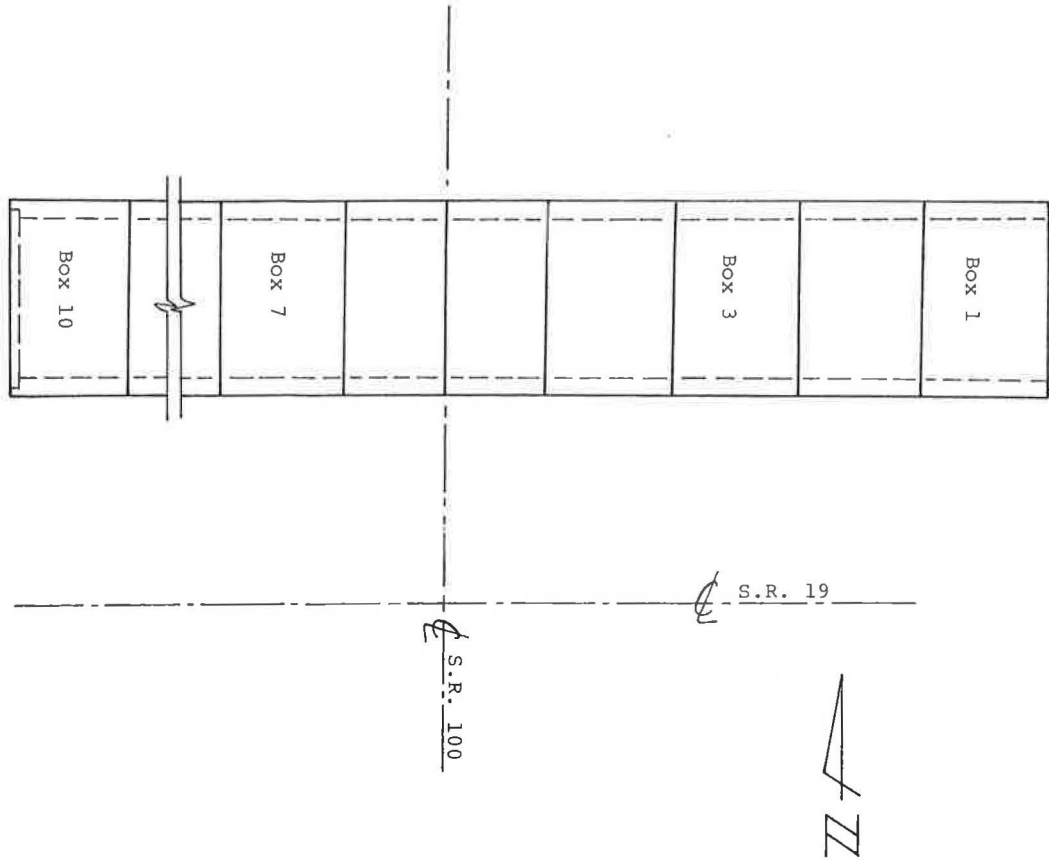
Arrangement of box culvert sections (Ohio DOT bridge CRA-19-17.10).
